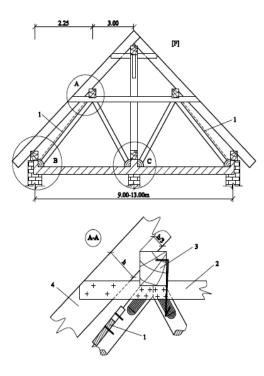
Longitudinal framing walls for 9.00 m< L < 13.00 m
